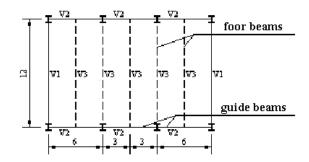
Schematic view of floor structural arrangement – configuration 01 (measures in m)
